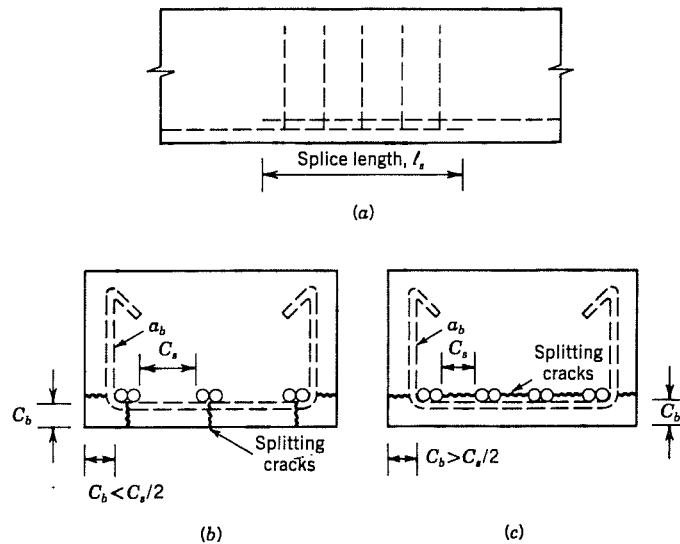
Transverse reinforcement. (a) side view of beam; (b) all splitting cracks restrained, $A_{tr} = a_b$; (c) two bars crossing plane of splitting through layer of bars, $A_{tr} = 2a_b/4$ splices^[7].
